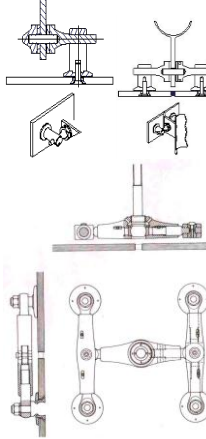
Anchoring Detail of Steel Bolt Clamping to the Glass by Point Fixing in the Joint (Schittich, C., et al, 1999)
